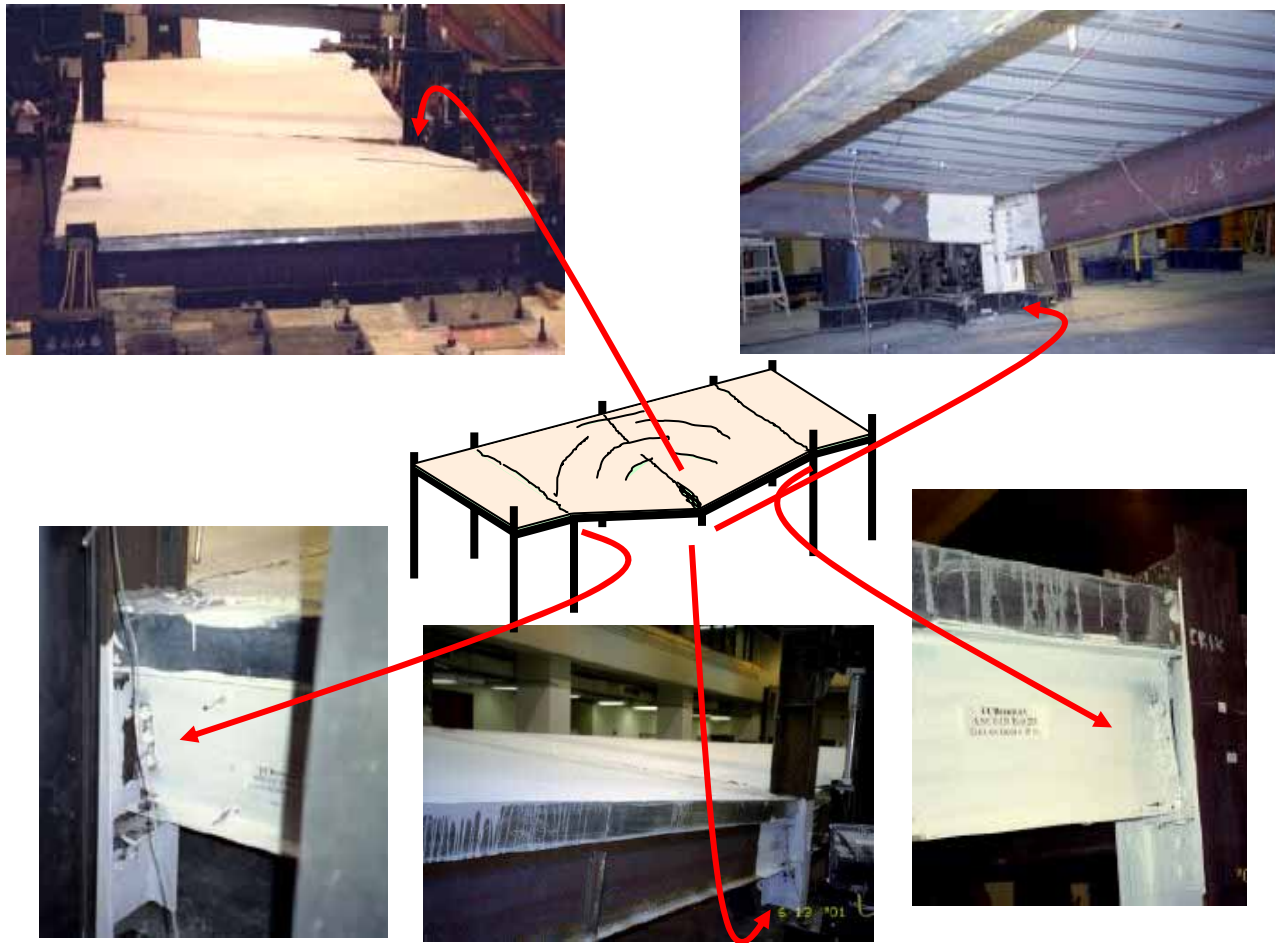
View of Specimen at the End of Test 2B (Column Drop of 35 inches)
